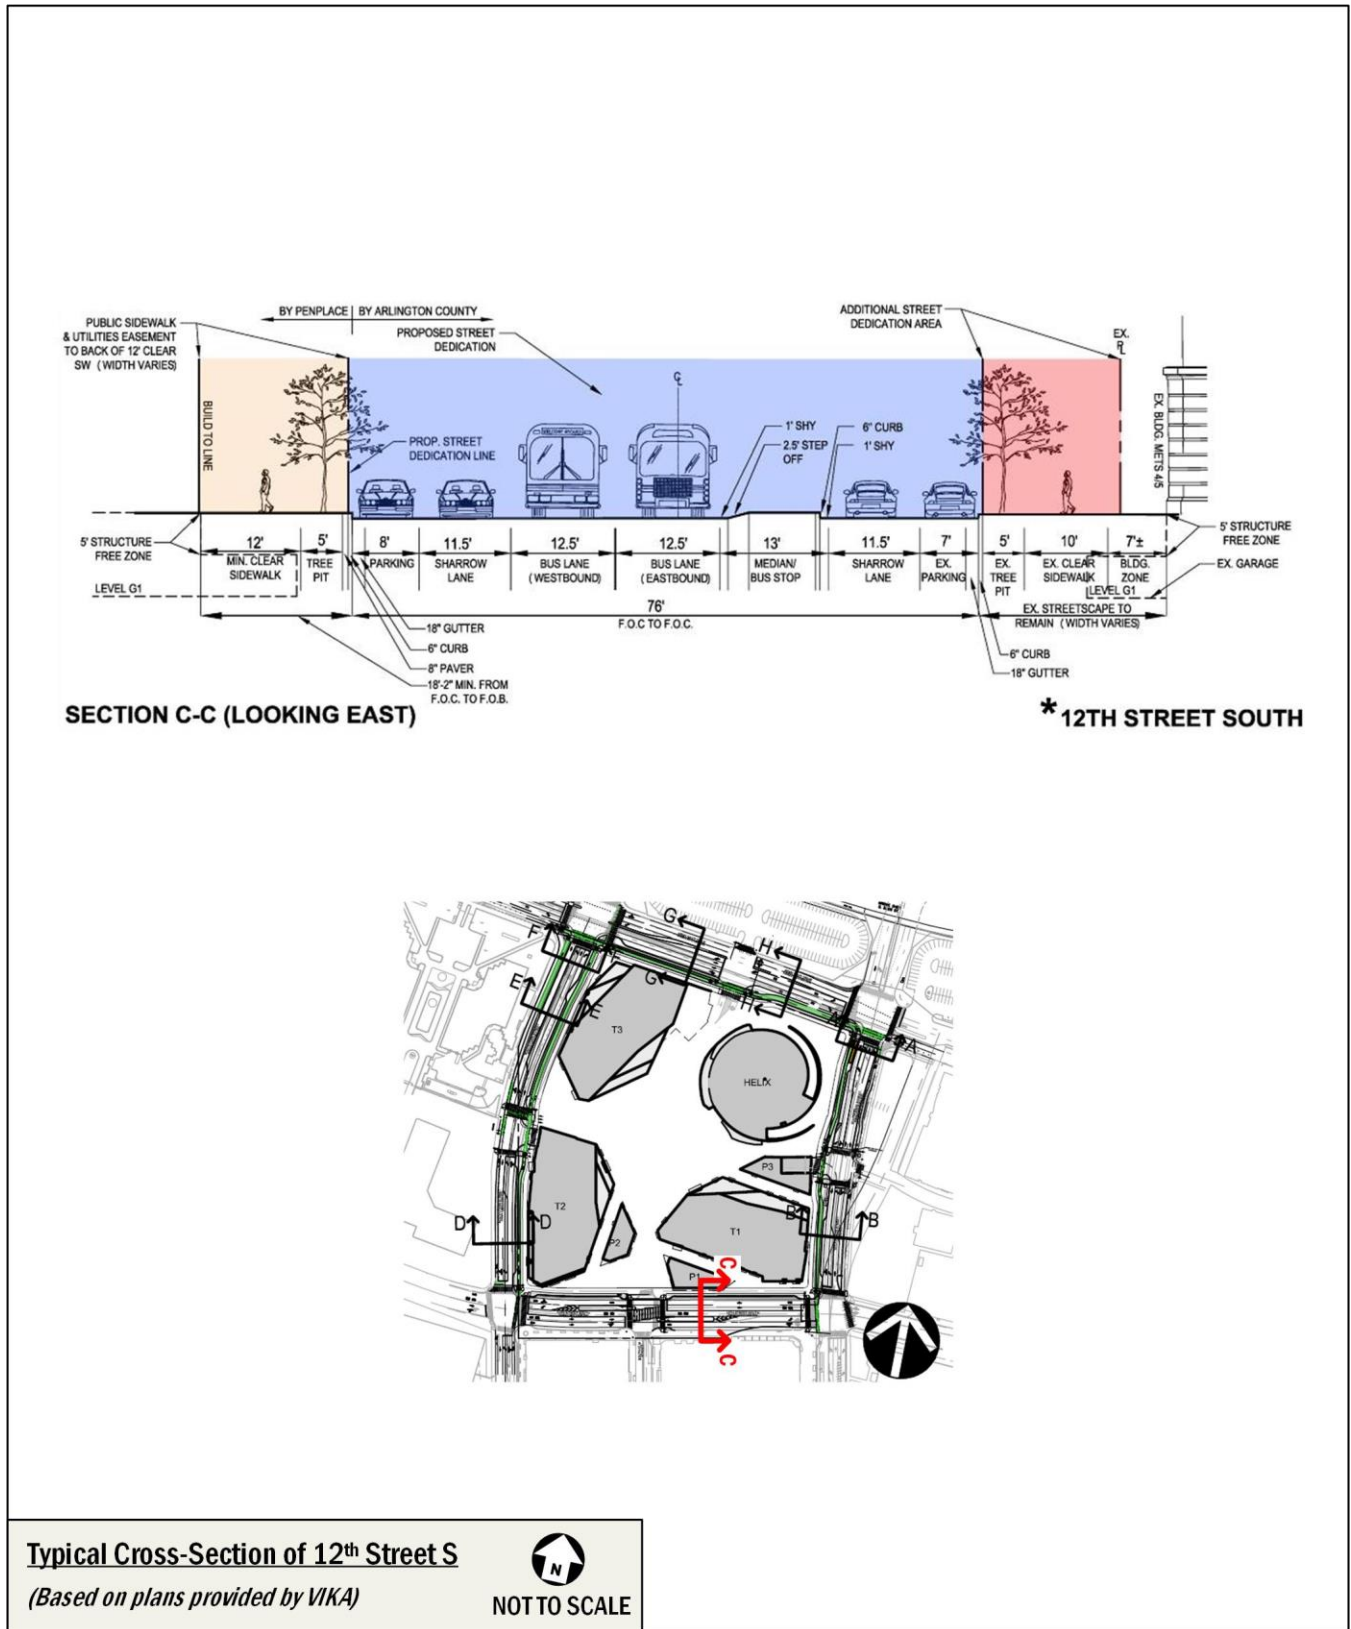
Typical Cross-Section of 12<sup>th</sup> Street S
